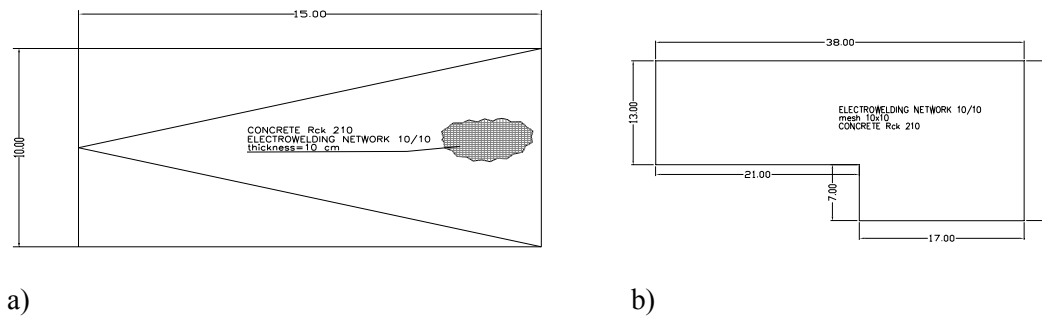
Design of the drying slab, a) Planimetry of drying slab, and b) Planimetry of second slab
